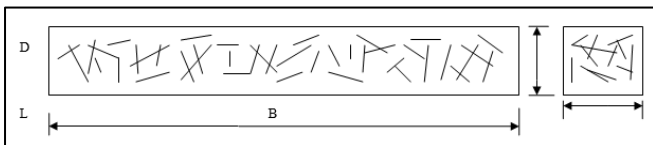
Details of Beam for Fiber Reinforced Concrete
